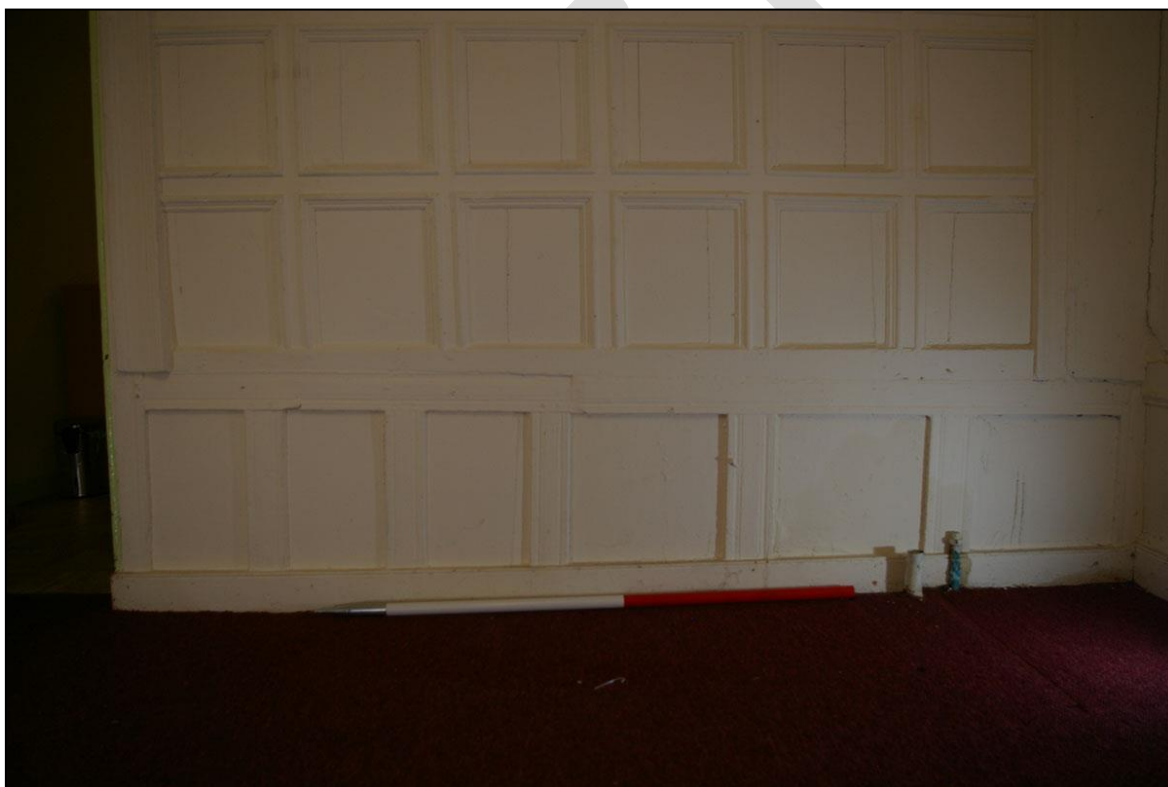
THE TWO PHASES OF PANELLING WITH 1M SCALE AT THE BASE OF THE NORTH WALL, TYPE 1 AND TYPE 2; FROM THE SOUTH.
